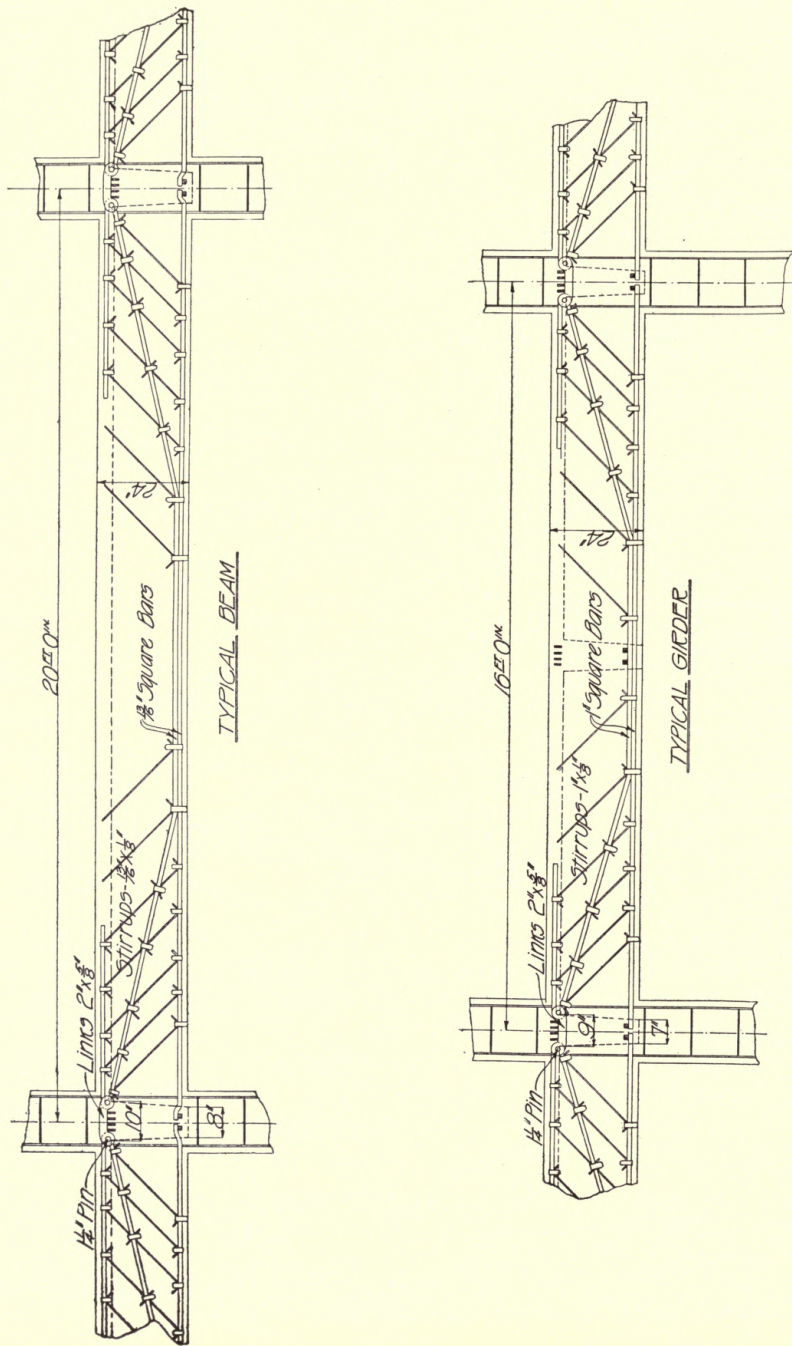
Details of Typical Pin-Connected Beam and Girder Reinforcement. (See p. 105.)
